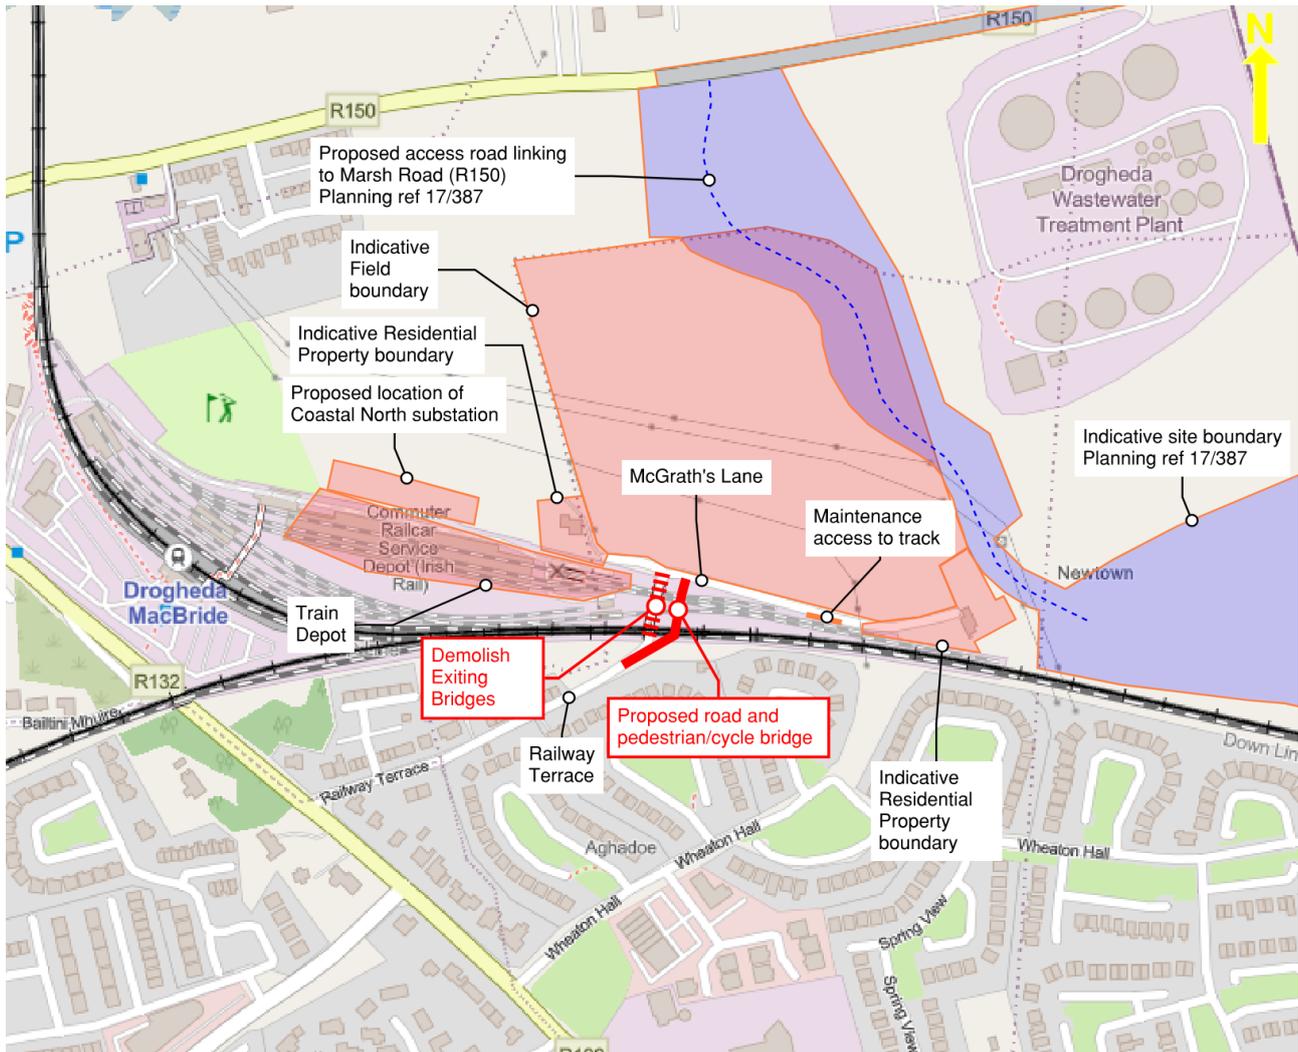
Plan view of proposed new bridge adjacent existing bridges
